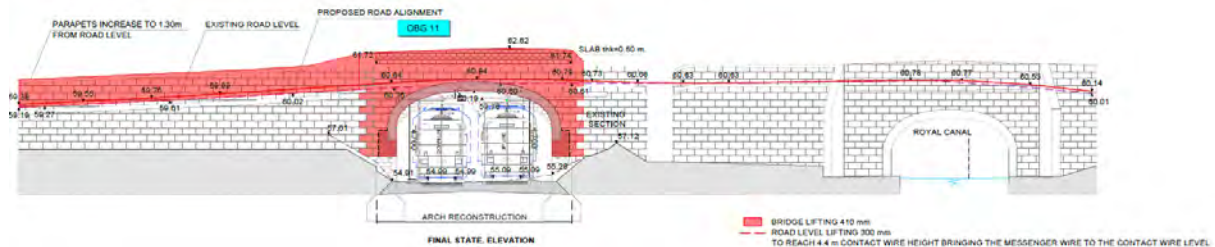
Deck reconstruction of OBG11 - Elevation
